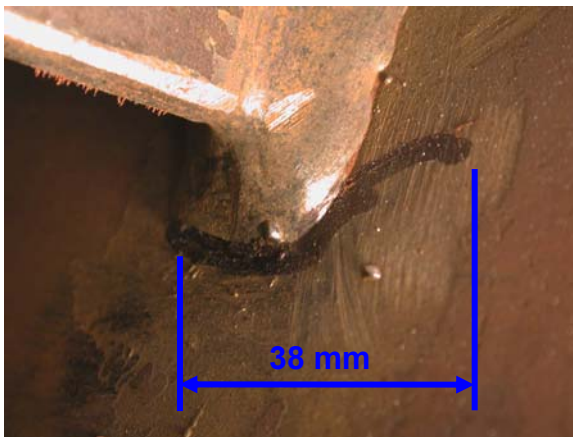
Specimen 1: Fatigue Crack at D1-R3-West
